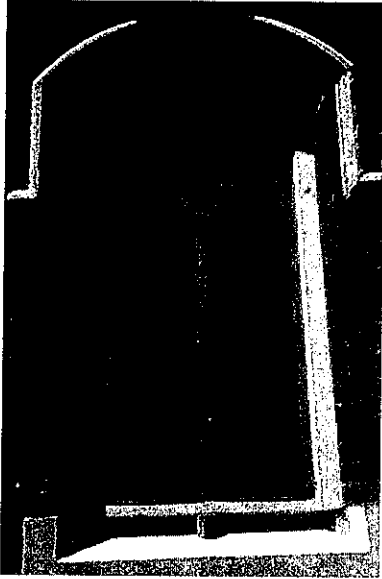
Exterior, north elevation. Detail of window 4. Note the introduced timber framing and the Perspex sheeting over the window.
